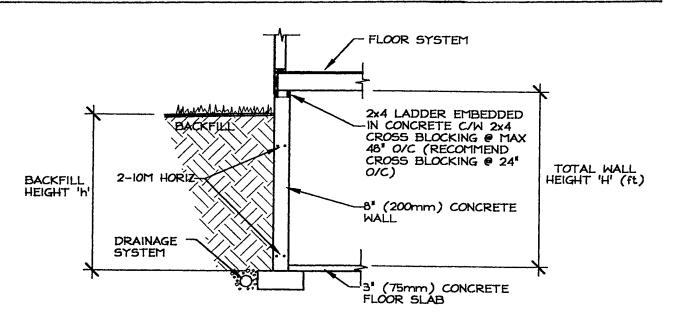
TYPICAL FOUNDATION WALL
